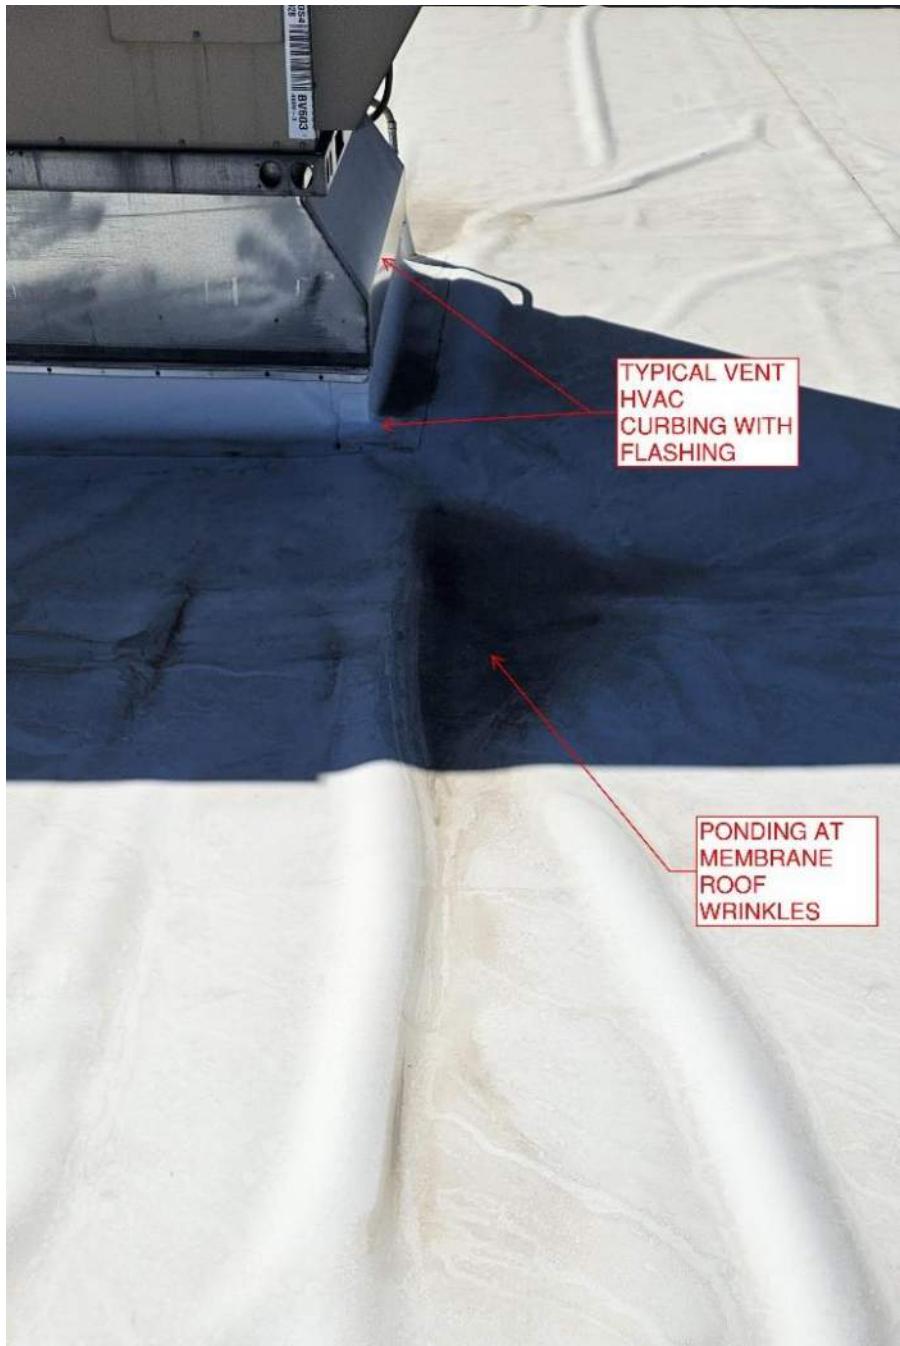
MINOR PONDING ON THE MEMBRANE ROOF
